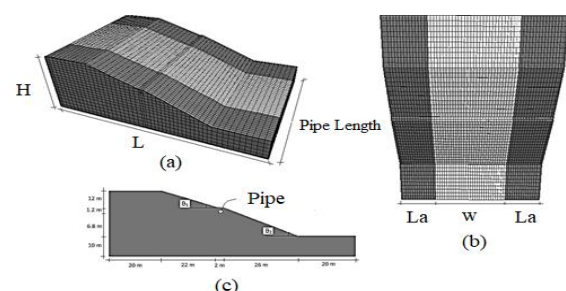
An assumed slope geometry; (a) Transverse view, (b) Plan, (c) Slope section
